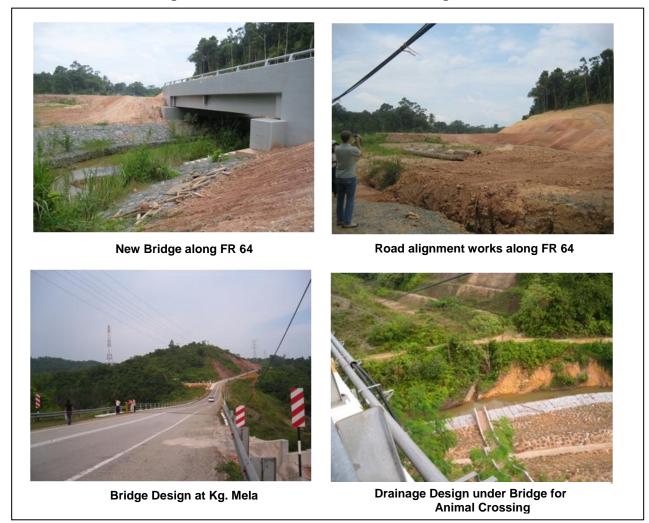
shows a portion of Federal Route No. 64 near Jerantut which is being upgraded. As can be seen from those figures, the upgrading works involve road straightening (realignment) works and the construction of new bridges to replace existing old bridges.
